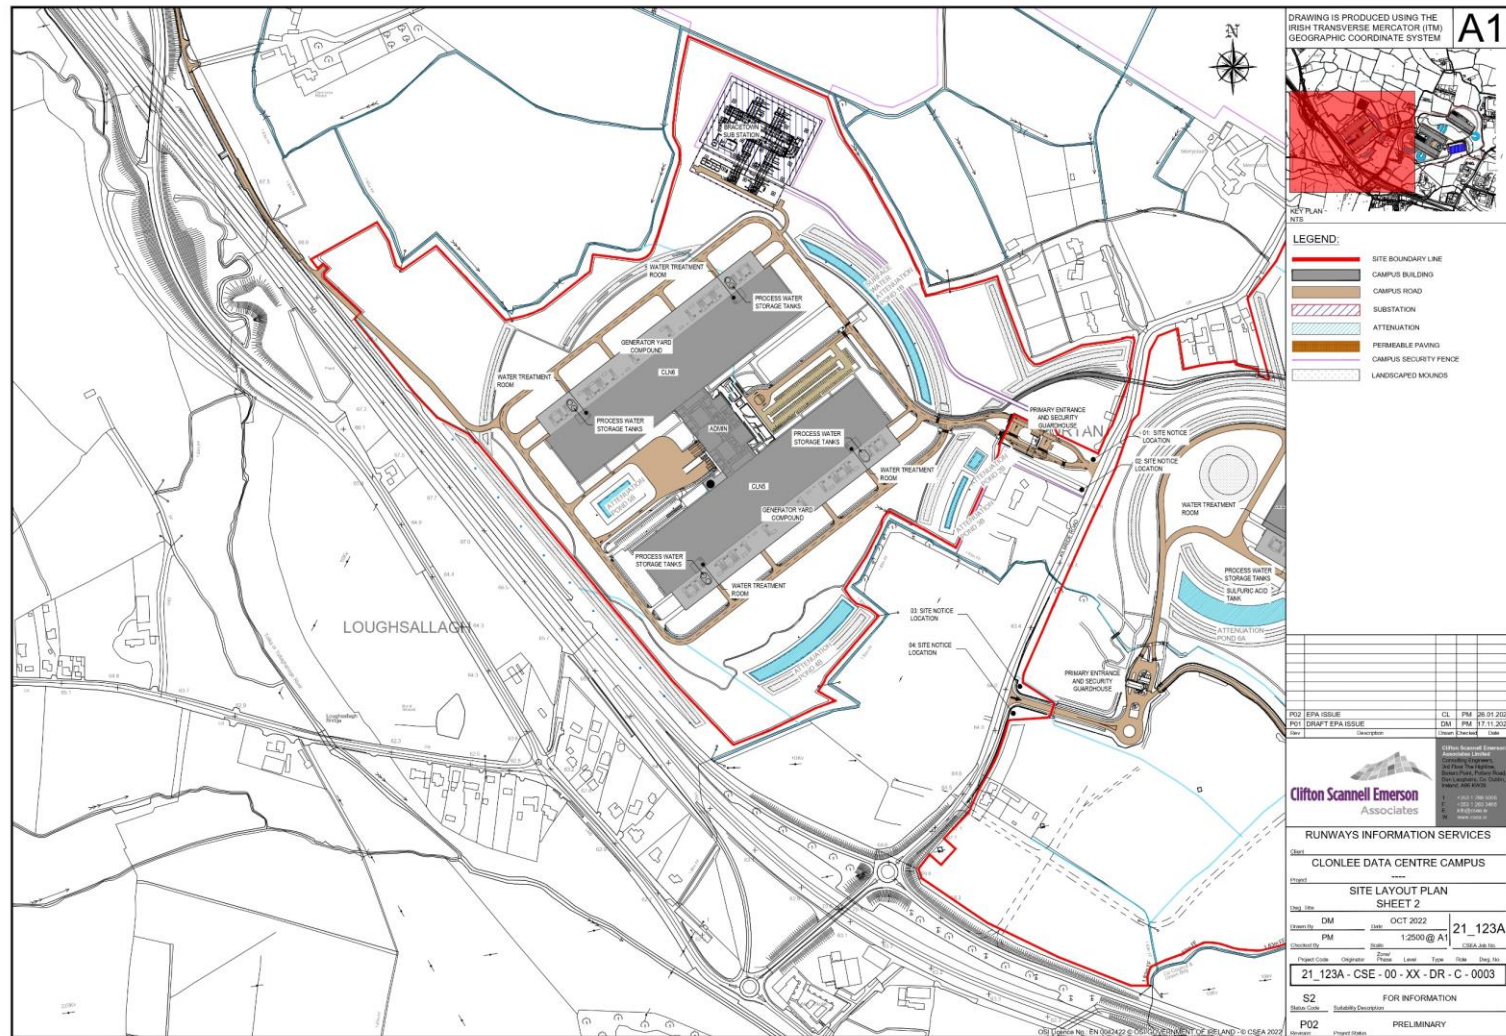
Plan showing redline boundary of the facility sheet 2 of 2.
